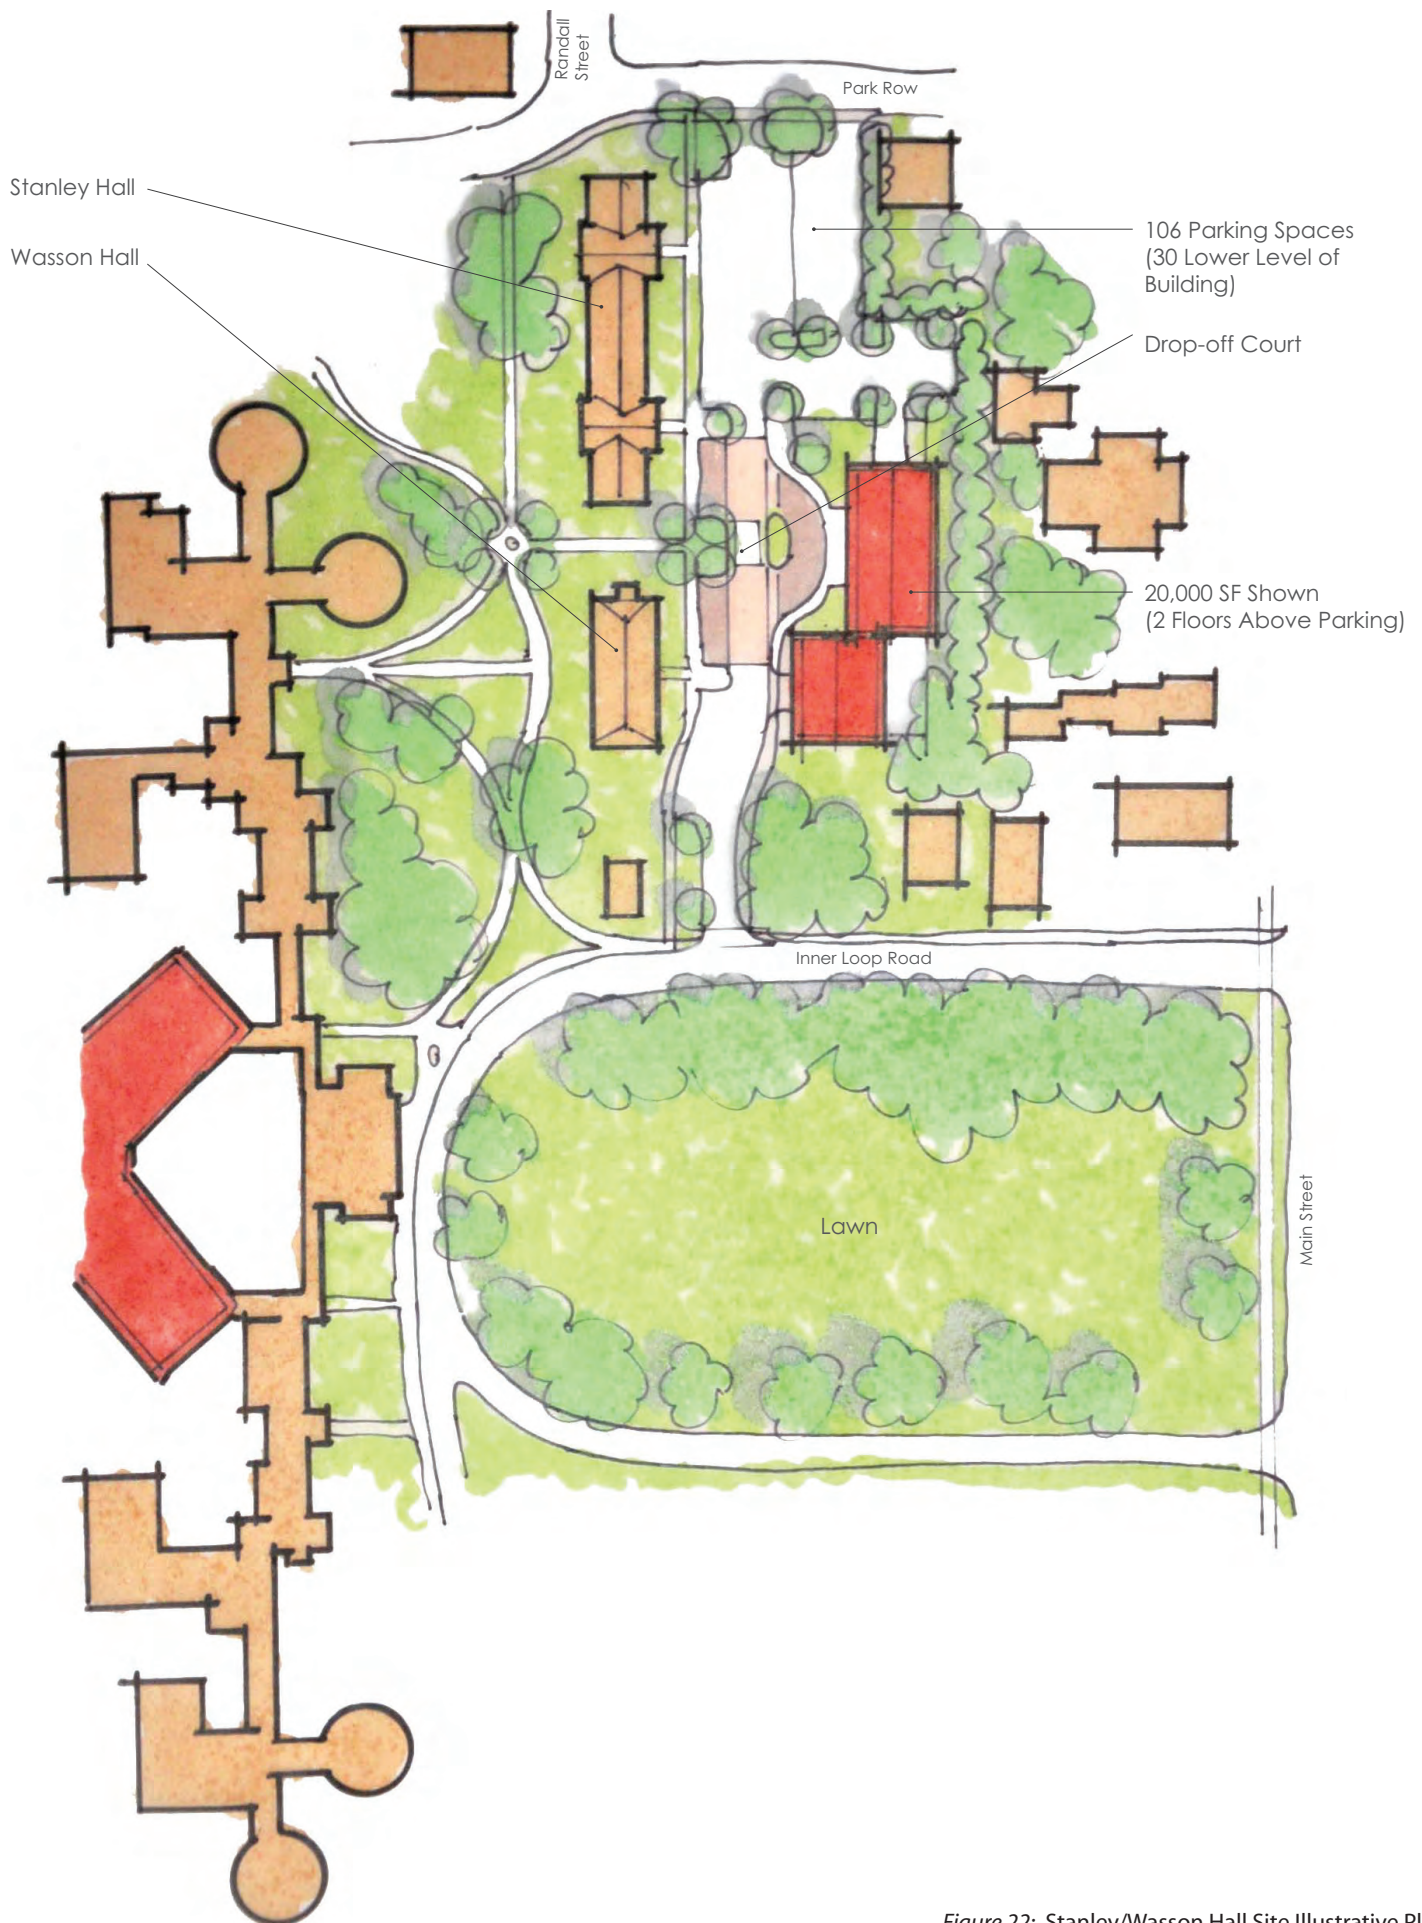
Stanley/Wasson Hall Site Illustrative Plan
